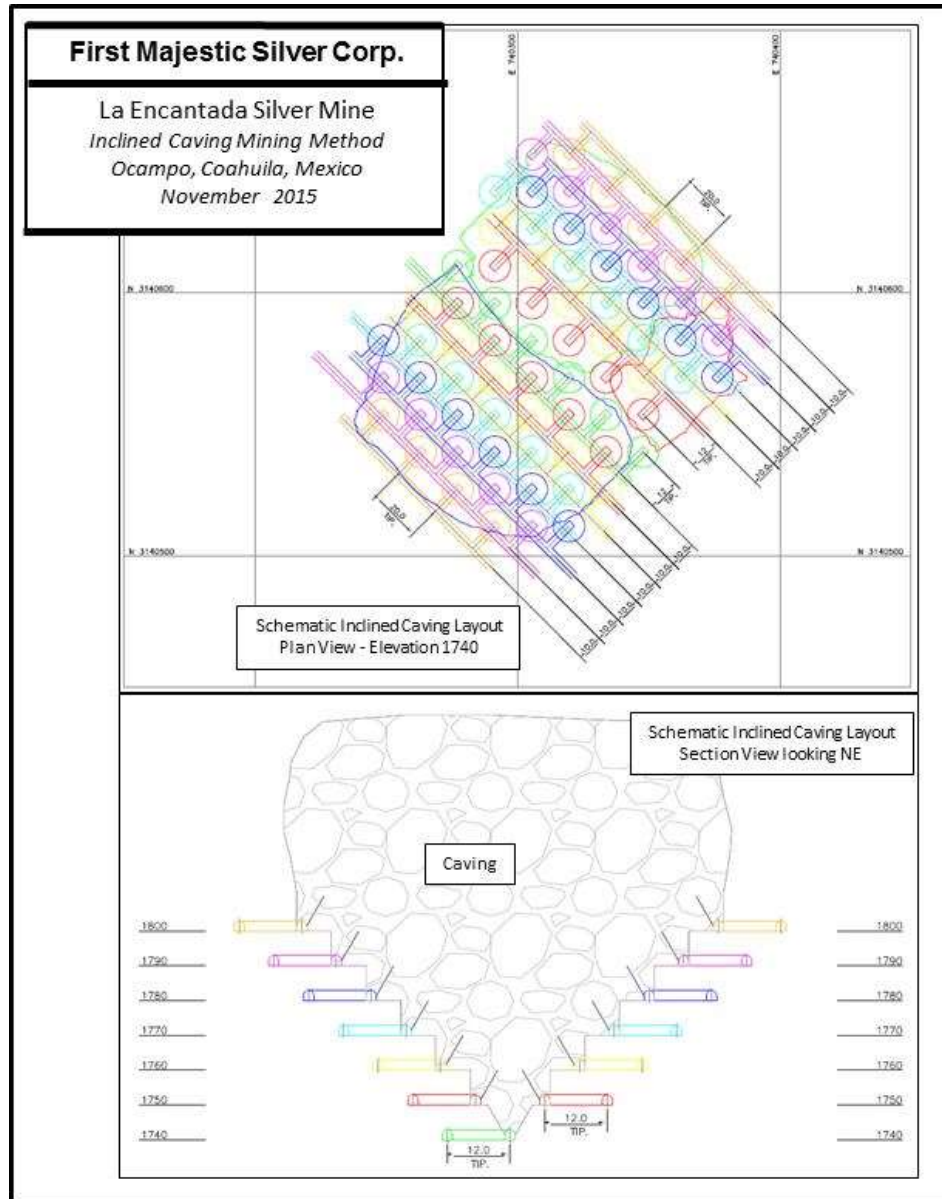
Schematic Inclined Caving layout in the San Javier and Milagros Breccias
